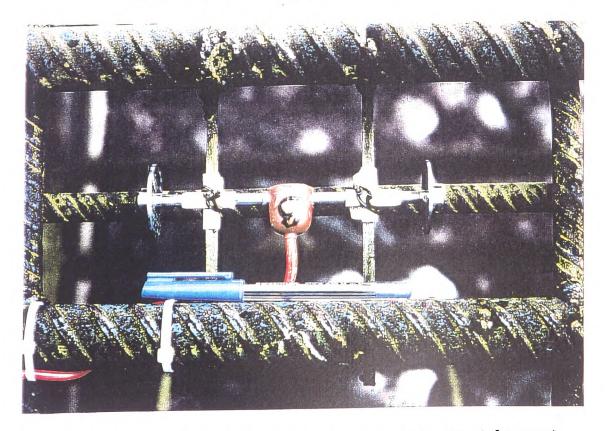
Detail of attaching a vibrating wire strain gauge to the pile reinforcement
